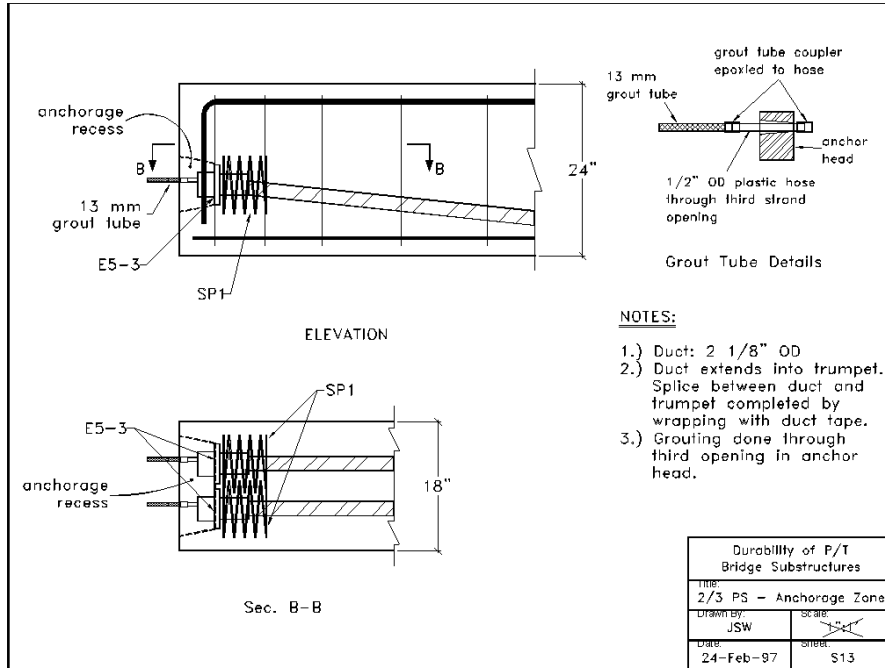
Sheet S13: 2/3 PS Anchorage Zone<sup>2</sup>
